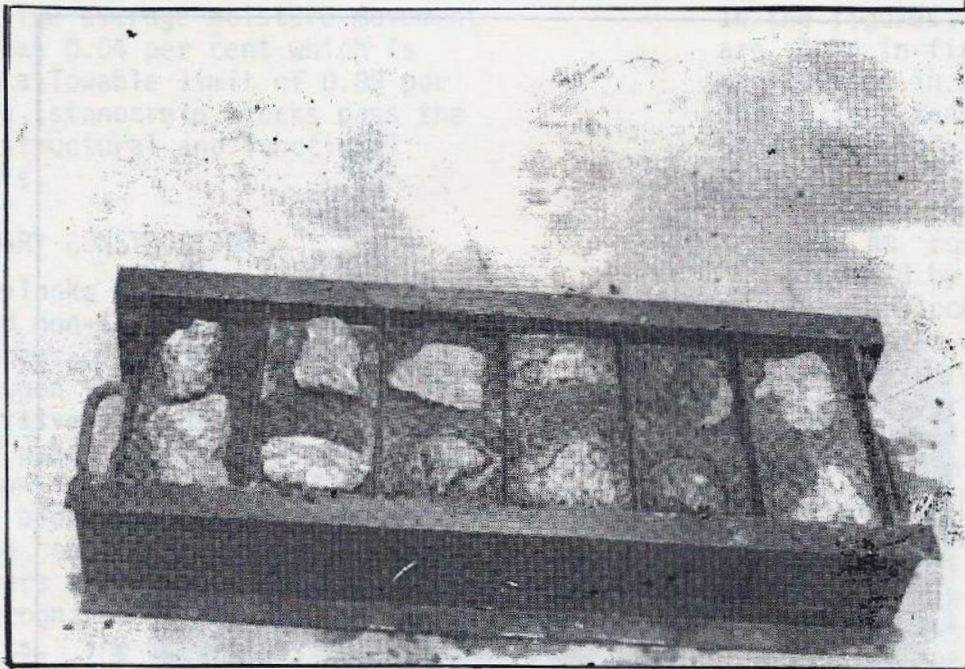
MOULD PARTIALLY FILLED WITH CONCRETE AND STONE PIECES
